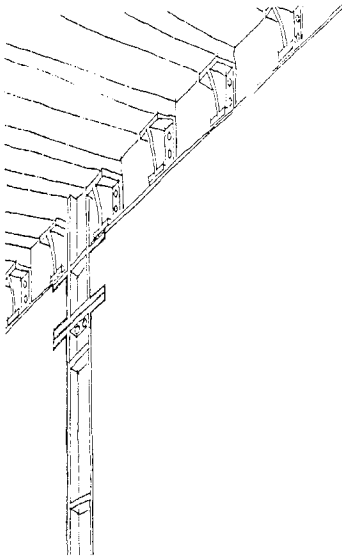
Warehouse 'De Vijf Werelddelen', Rotterdam (1878). Design for the construction of a bearing wall under the beam and between the columns
